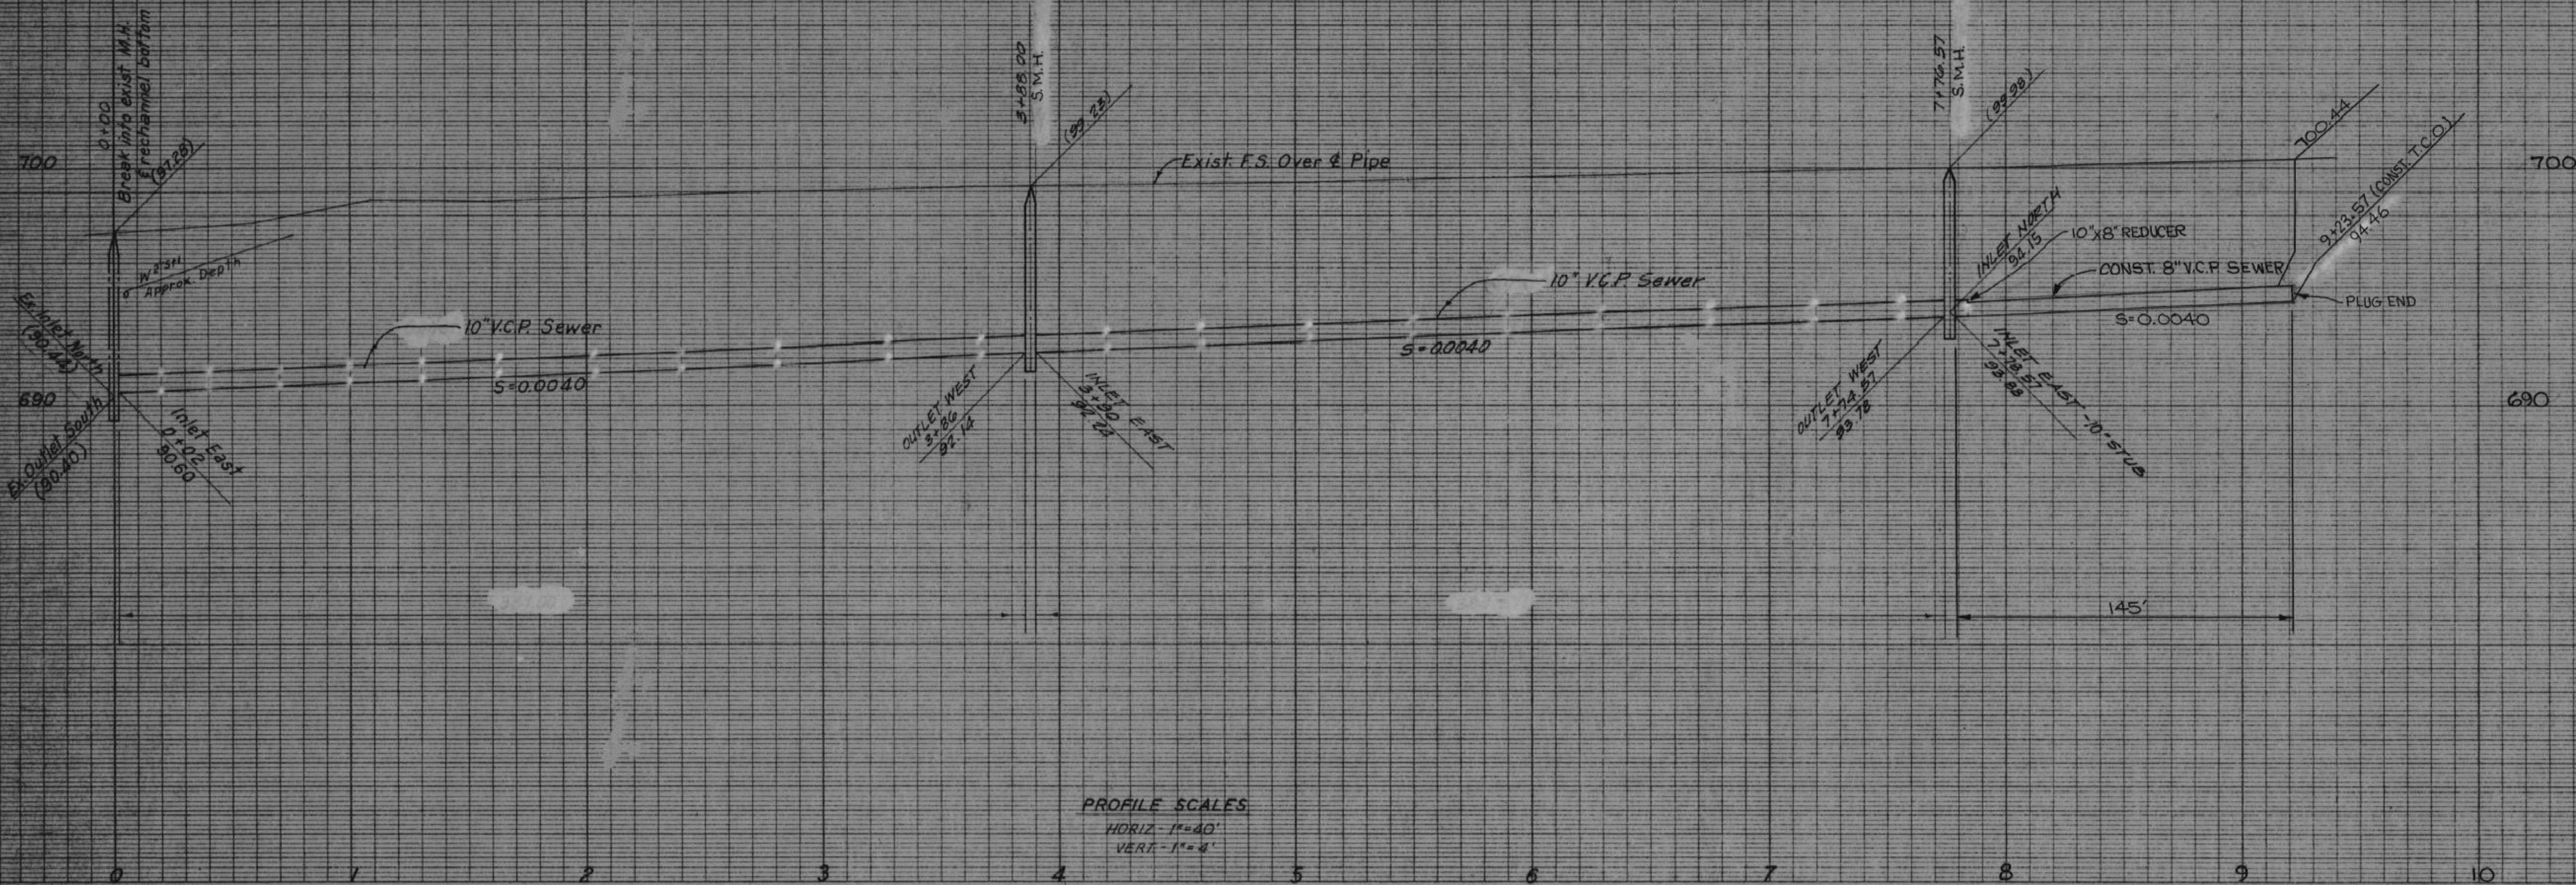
PLAN - PROFILE, O.P.' & R.E. STANDARD
